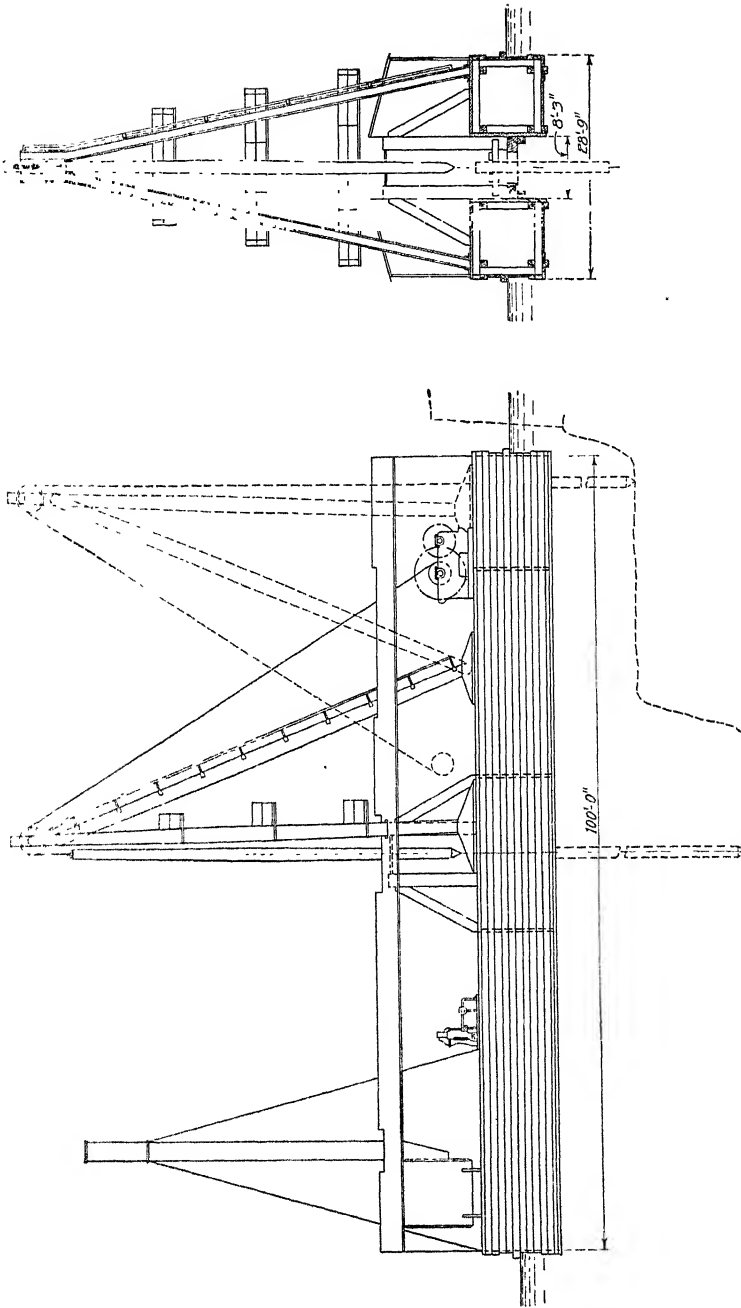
Side Elevation and Cross-Section of Lobnitz Rock Cutter
